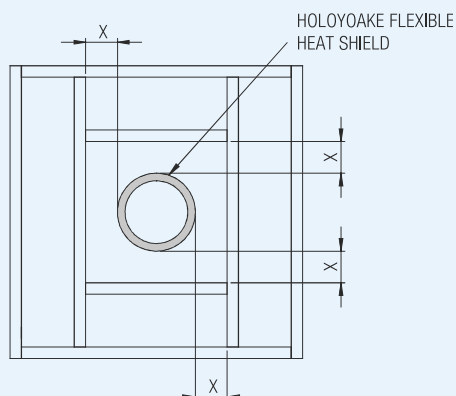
NO ADDITIONAL LINING REQUIRED
